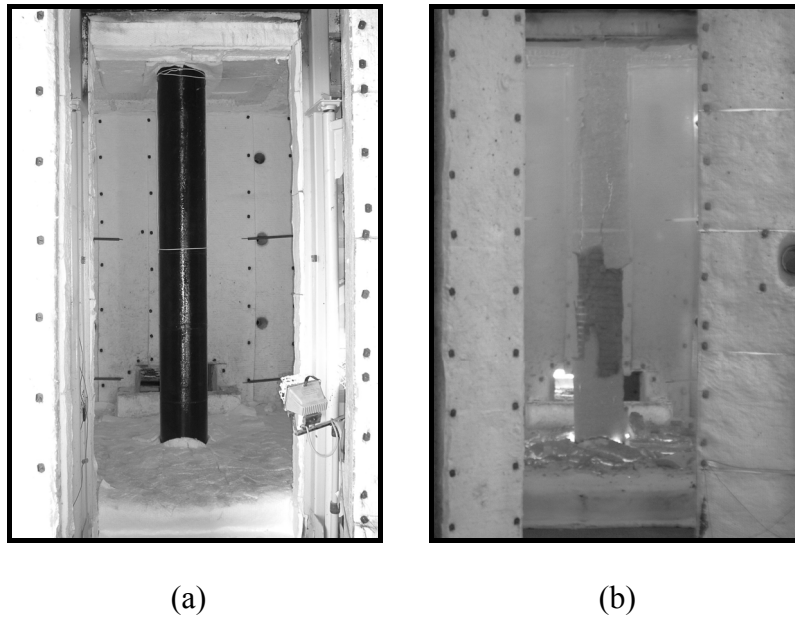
Column 3: FRP-wrapped Concrete Column (a) before fire test, and (b) immediately after fire test
